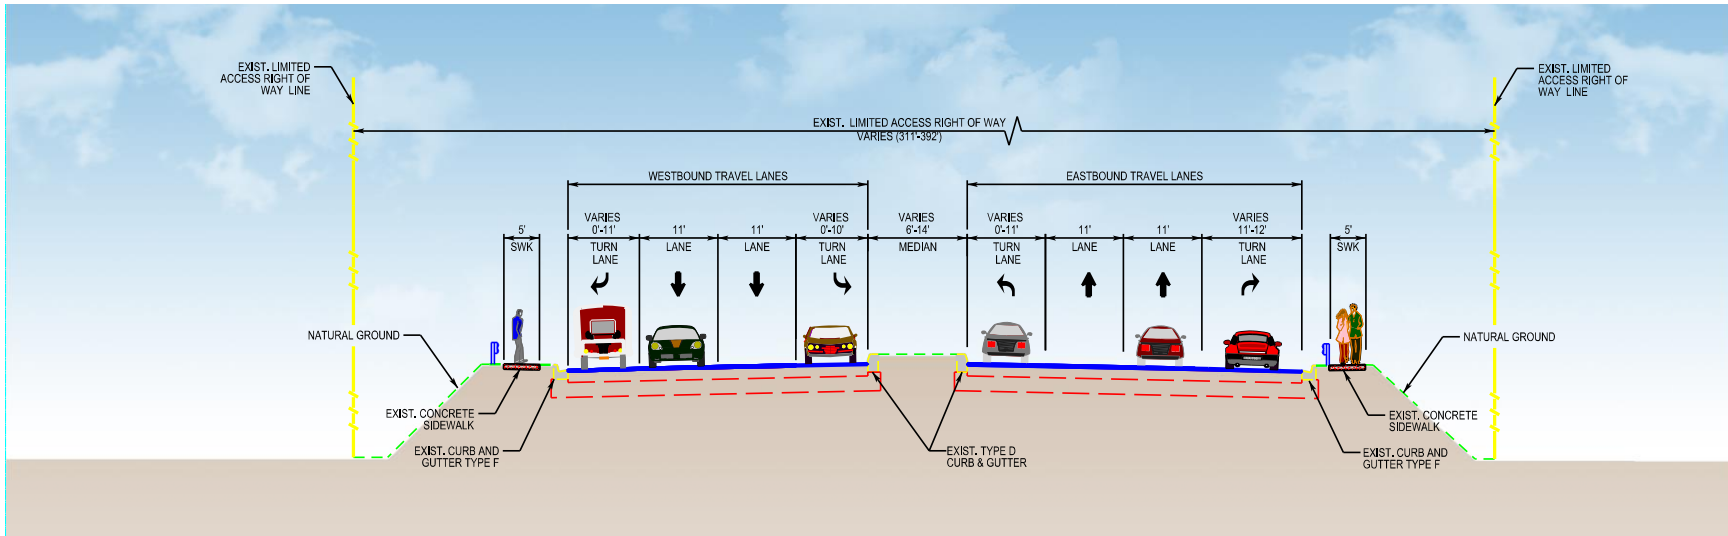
Lantana Road from Sunset Road to SR 9/I-95
